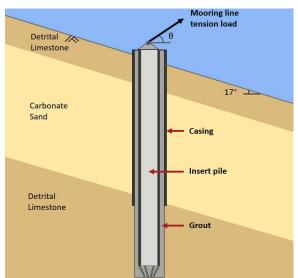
Drilled and grouted pile arrangement (East cluster example)
